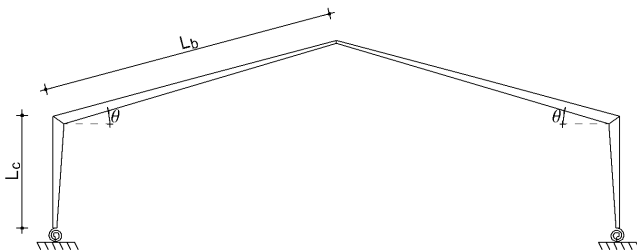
Symmetric pitched-roof frame with web-tapered columns and beams considered by Sesink [7]
